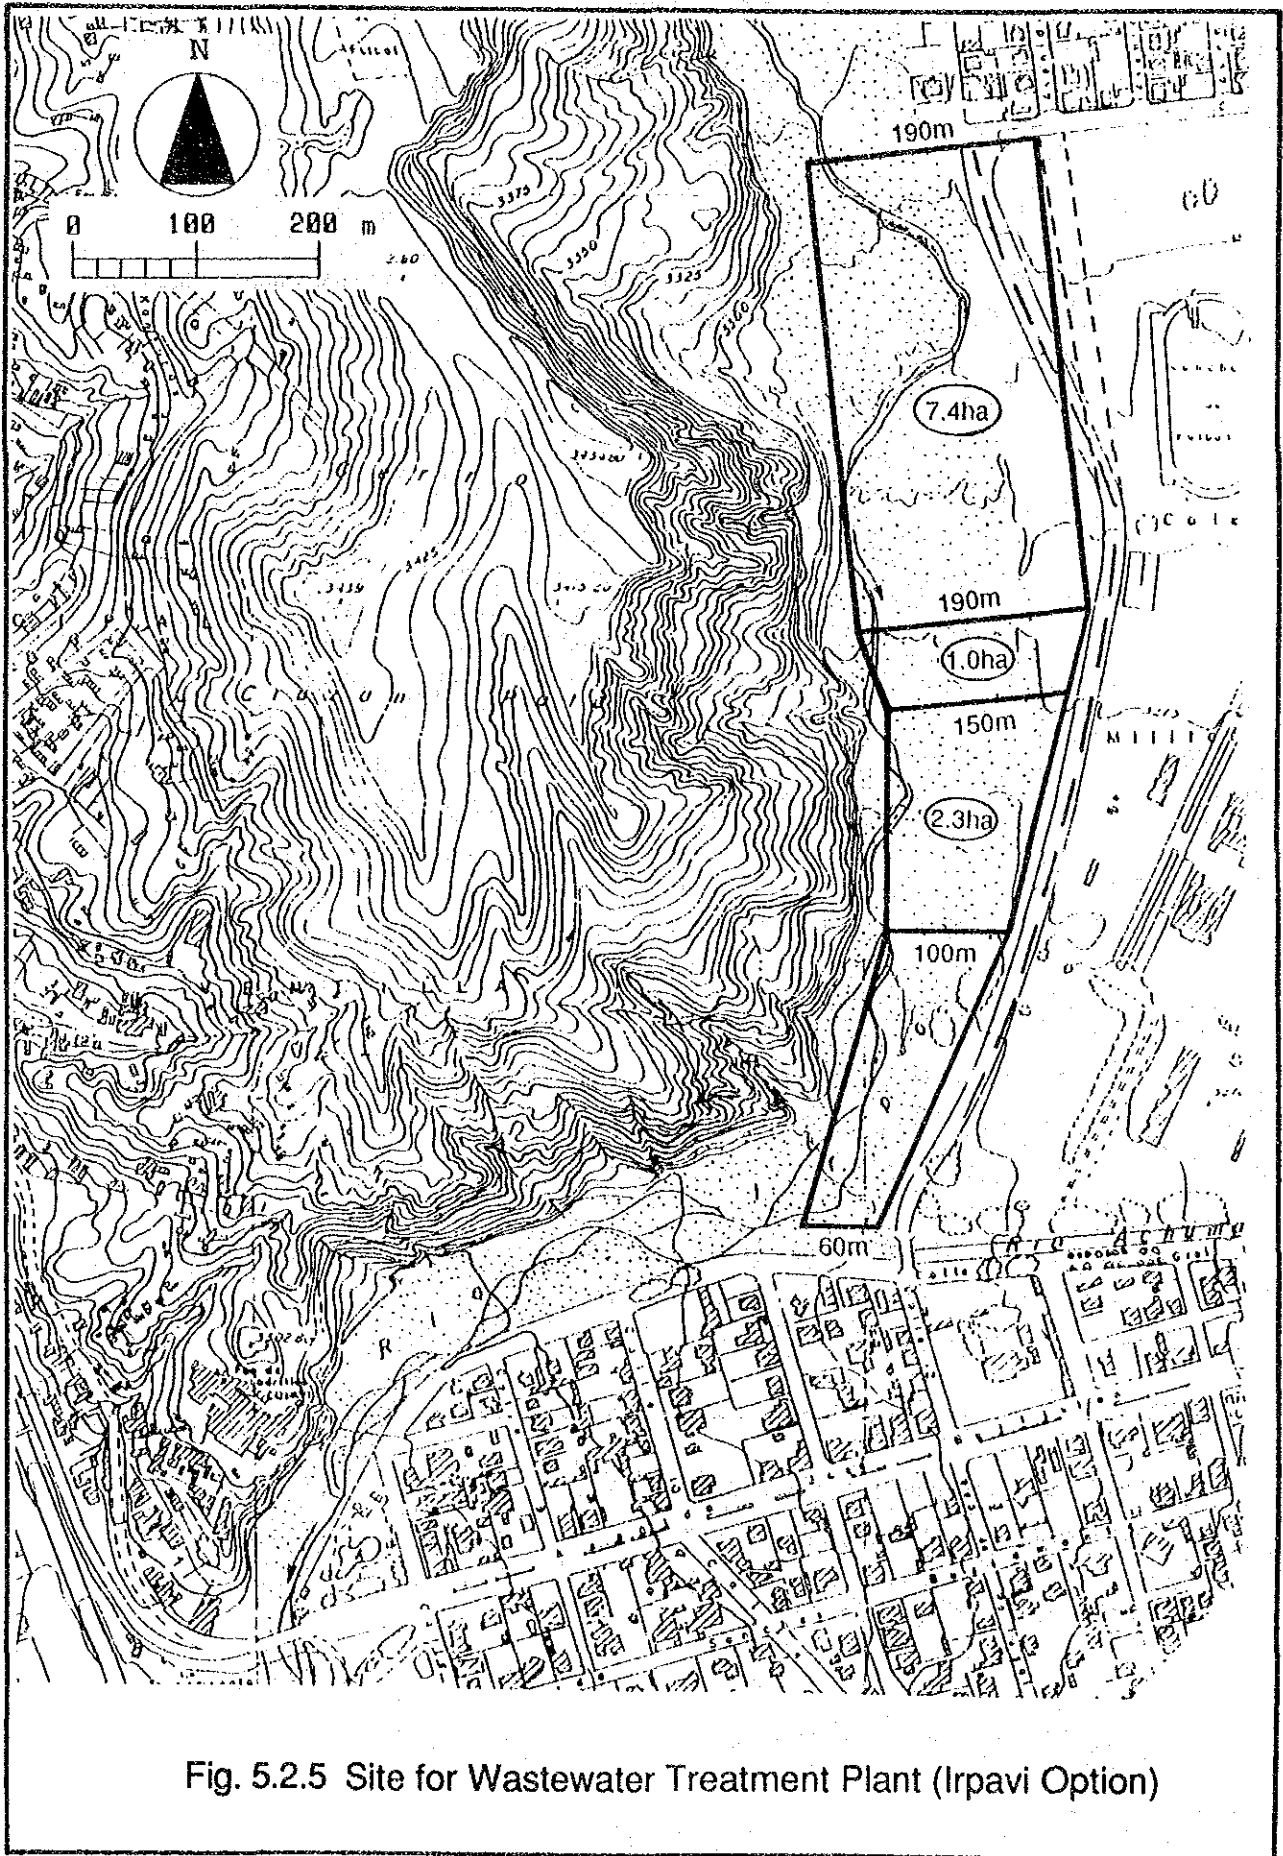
Site for Wastewater Treatment Plant (Irpavi Option)
